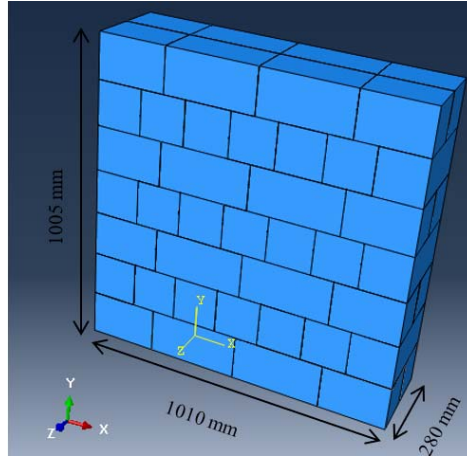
Typical geometry for unstrengthened Double-Wythe Stone Masonry Walls.
